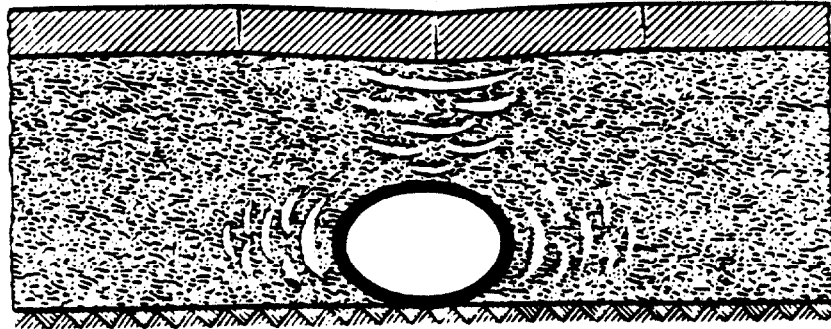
Pavement failure due to inadequate compaction of material quality adjacent to flexible pipe.<sup>(3)</sup>
